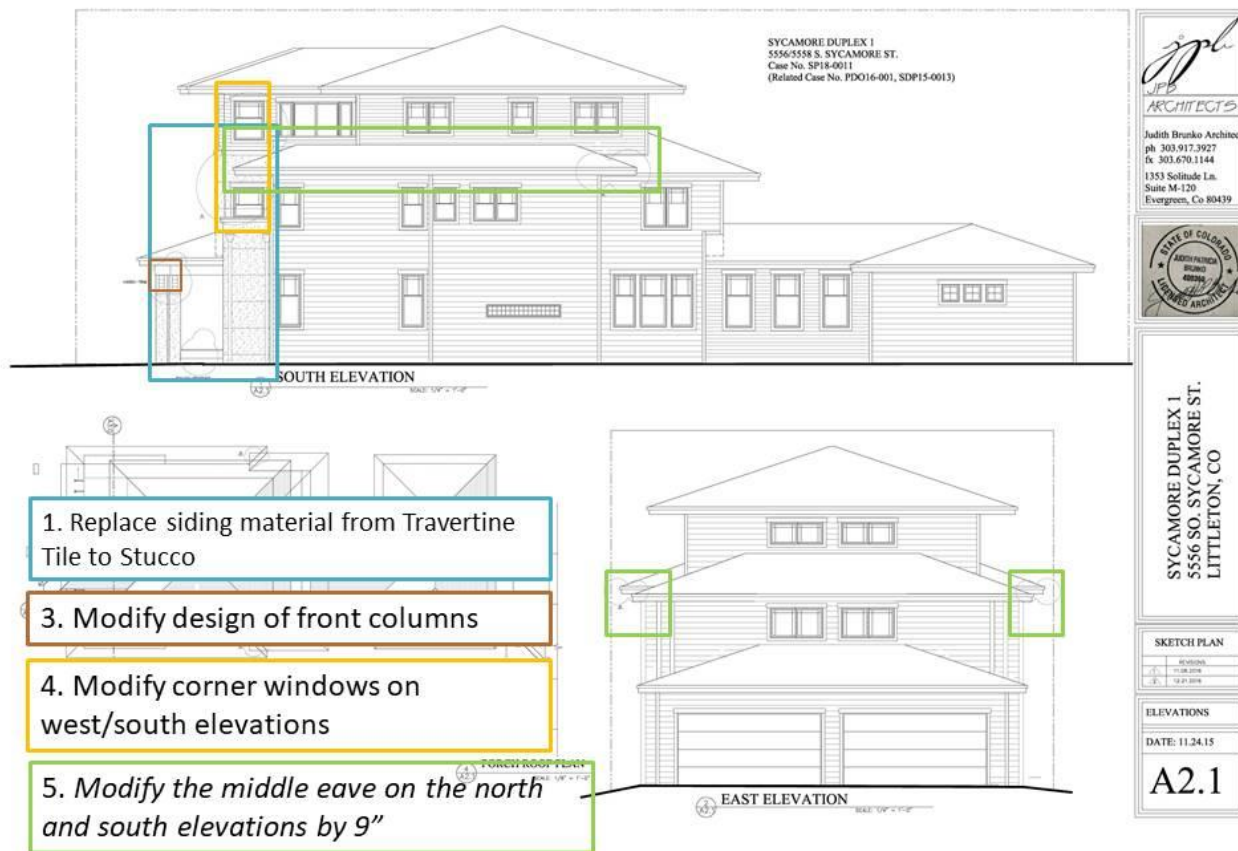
Proposed Sketch Plan with Highlighted Change Locations (East and South Elevations)
